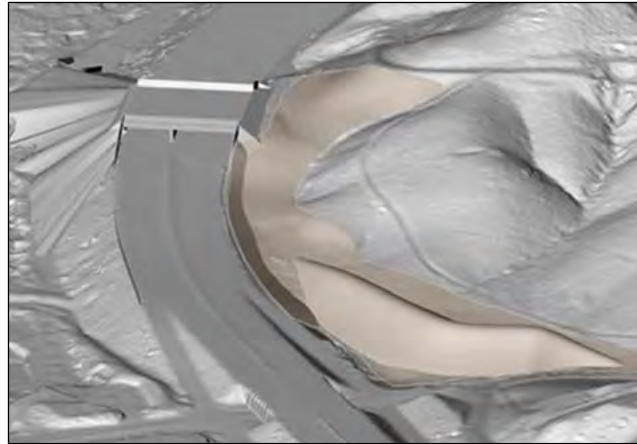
A 3-D model design of the approach zone to the Wallis Annenberg Wildlife Crossing over US-101. Tan areas were modified through virtual excavation and fill to create a quiet, dark path within the crossing structure.
